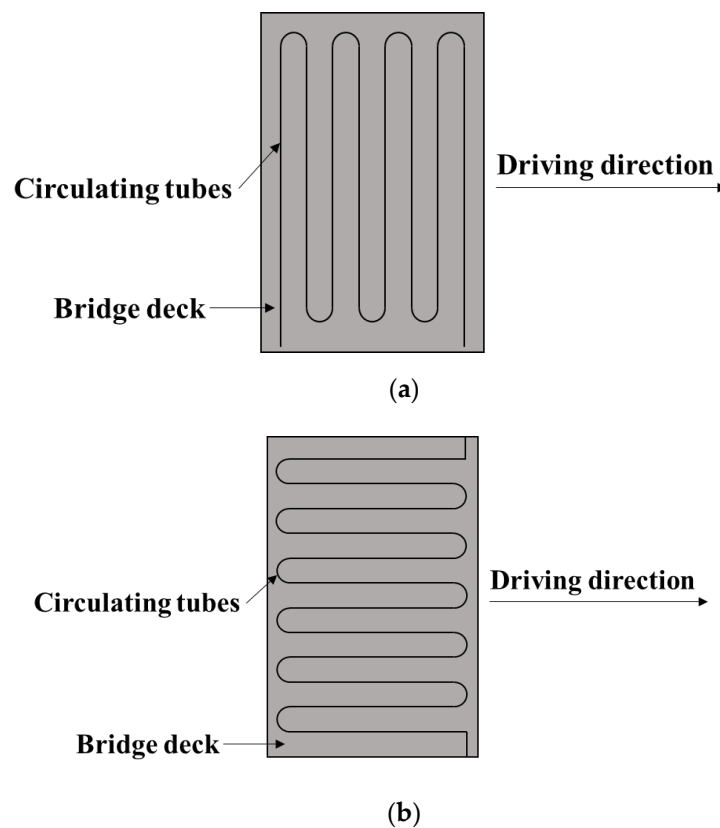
Schematic of the (a) horizontal layout and (b) vertical layout (plan view of the bridge deck).
